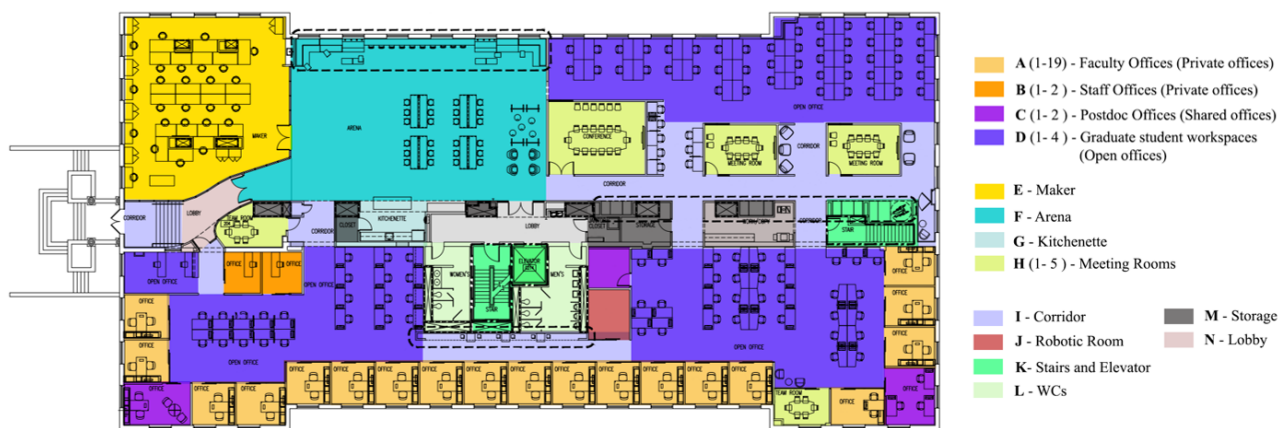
Floor plan of the Link Lab with labeled occupant spaces [3]
